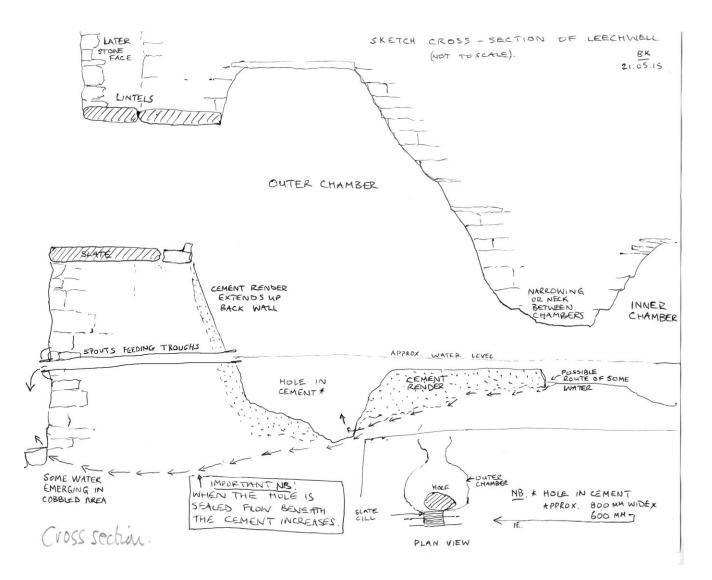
Cross-section and plan view of the interior of the inner chamber showing cement lining, hole, water level and position of spouts.
